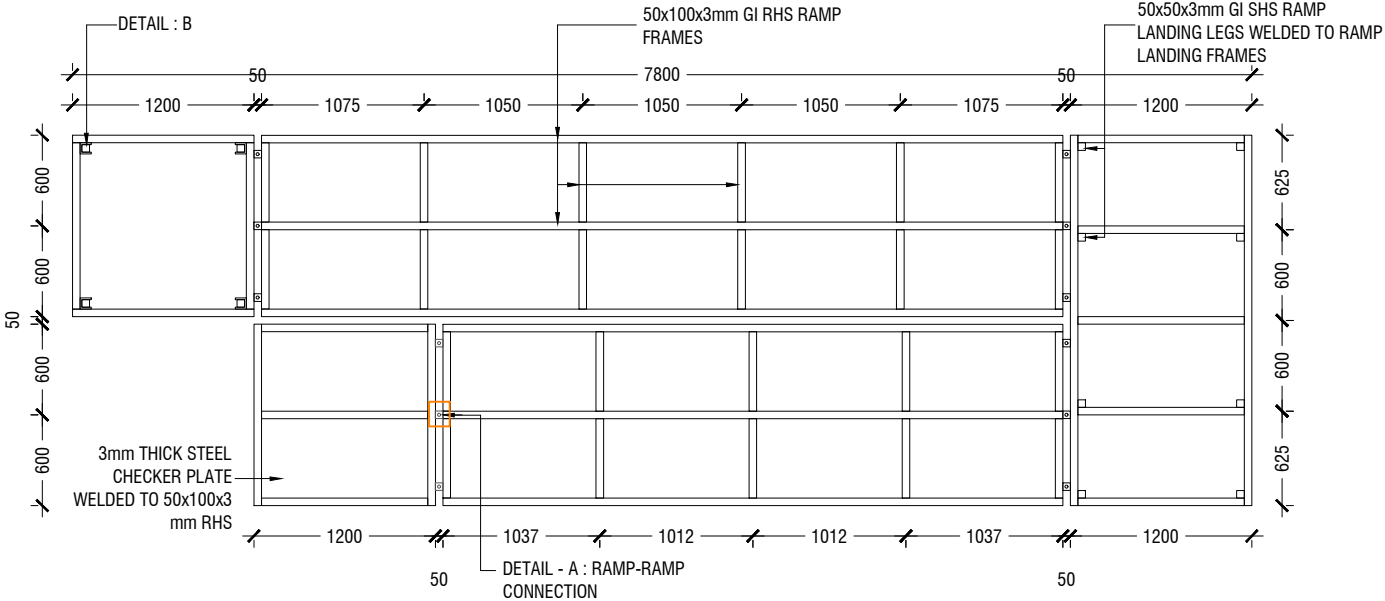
(MAIN ENTRANCE RAMP DETAIL)
